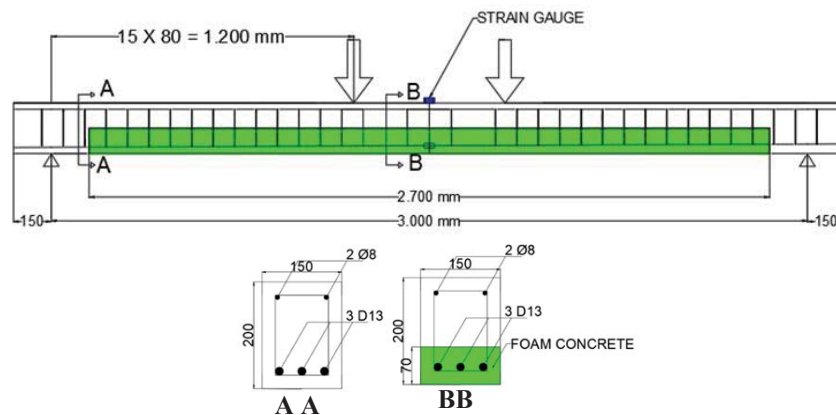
Sample specimen of hybrid beam with foam concrete
